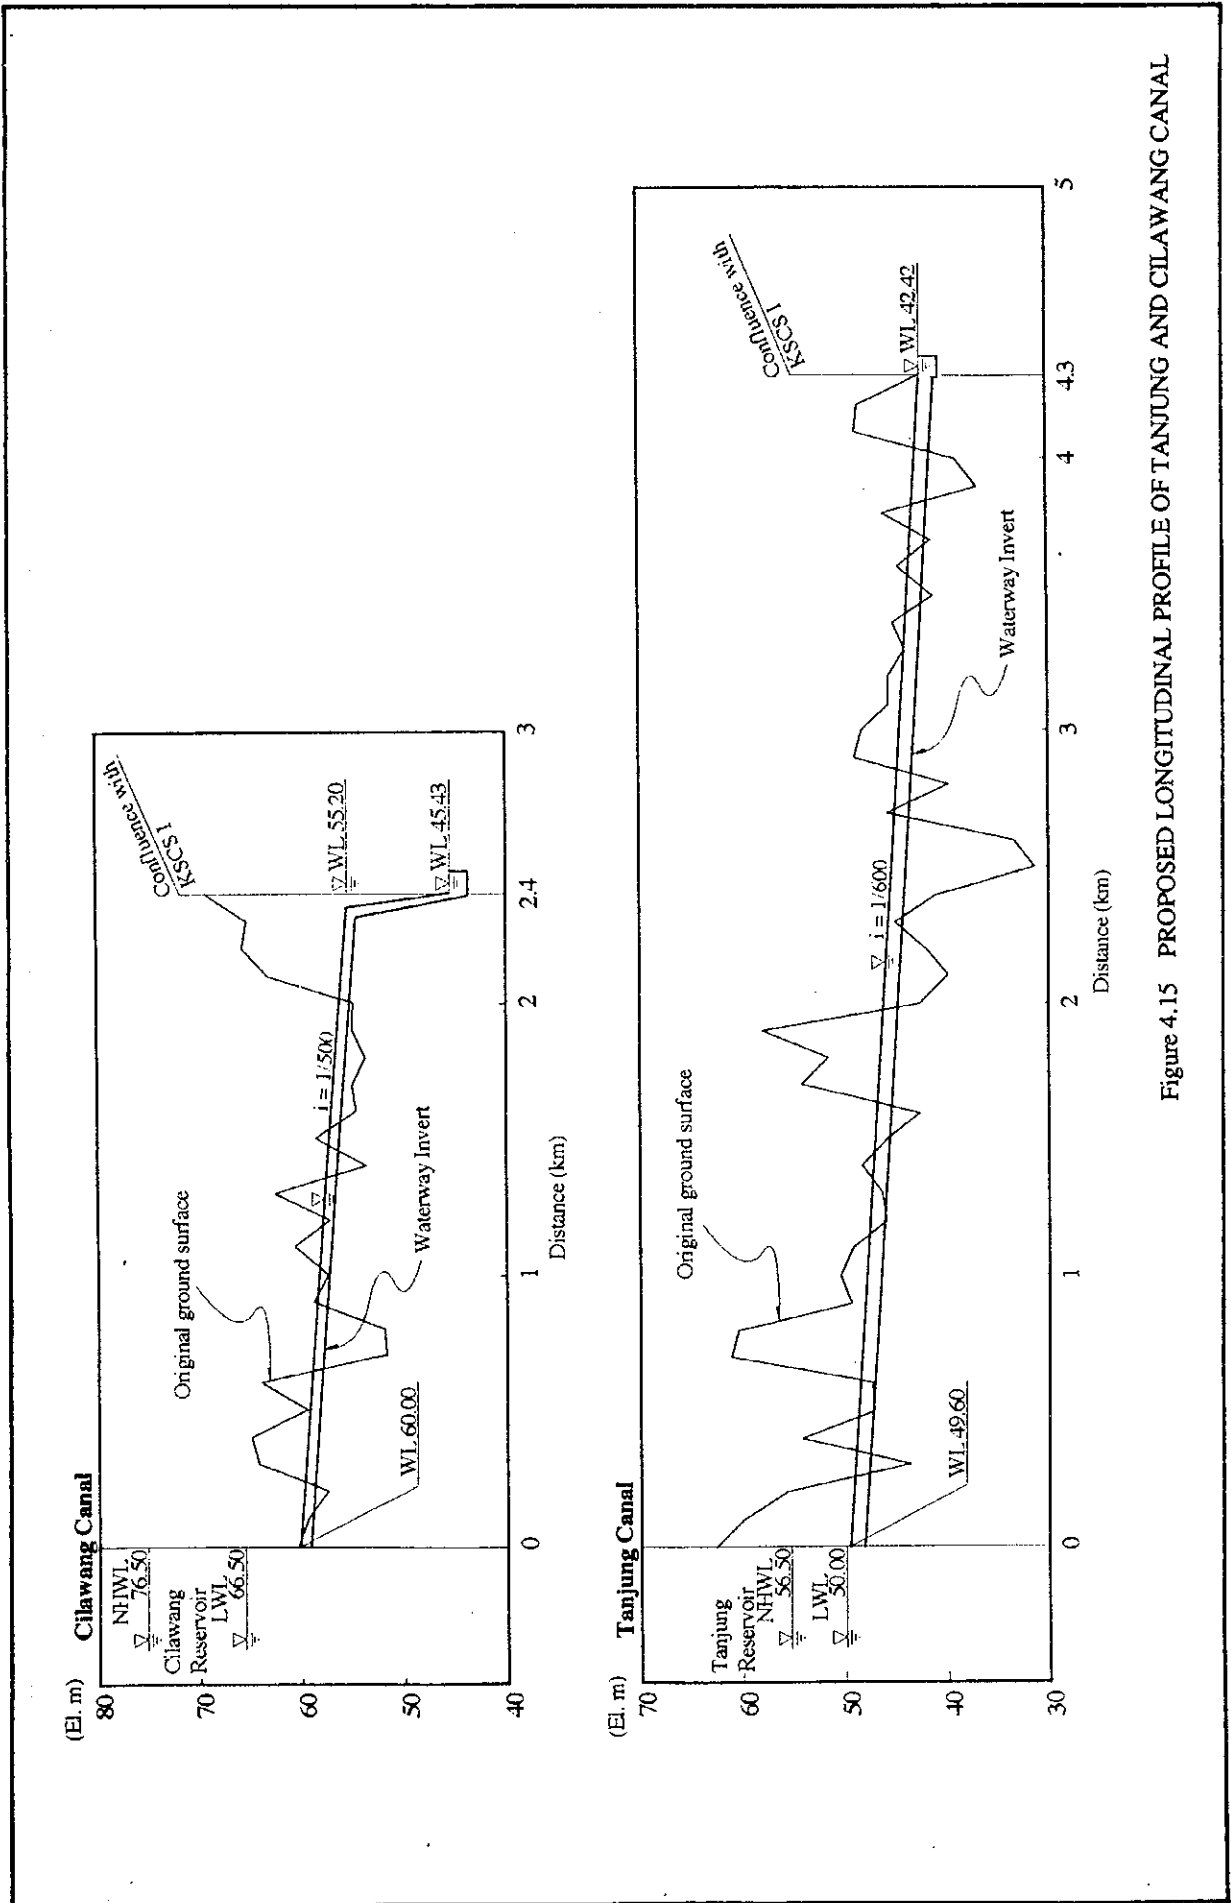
PROPOSED LONGITUDINAL PROFILE OF TANJUNG AND CILAWANG CANAL
